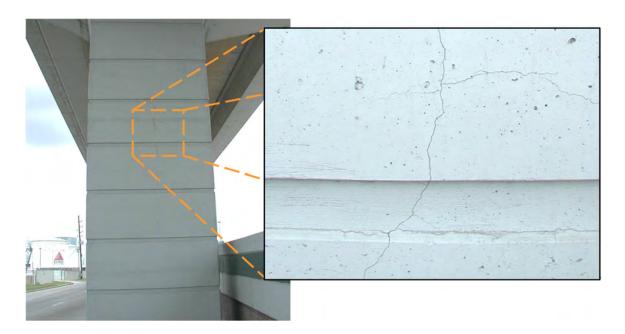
Thermal cracking in a Texas bridge element (Photo courtesy of Dr. J.C. Liu)
